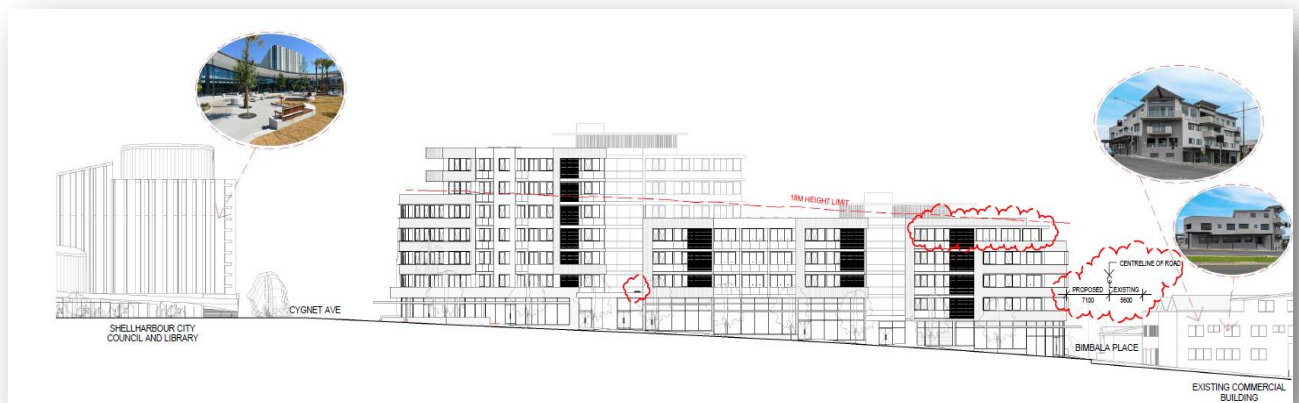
College Avenue Streetscape Montage (Eastern Elevation)
